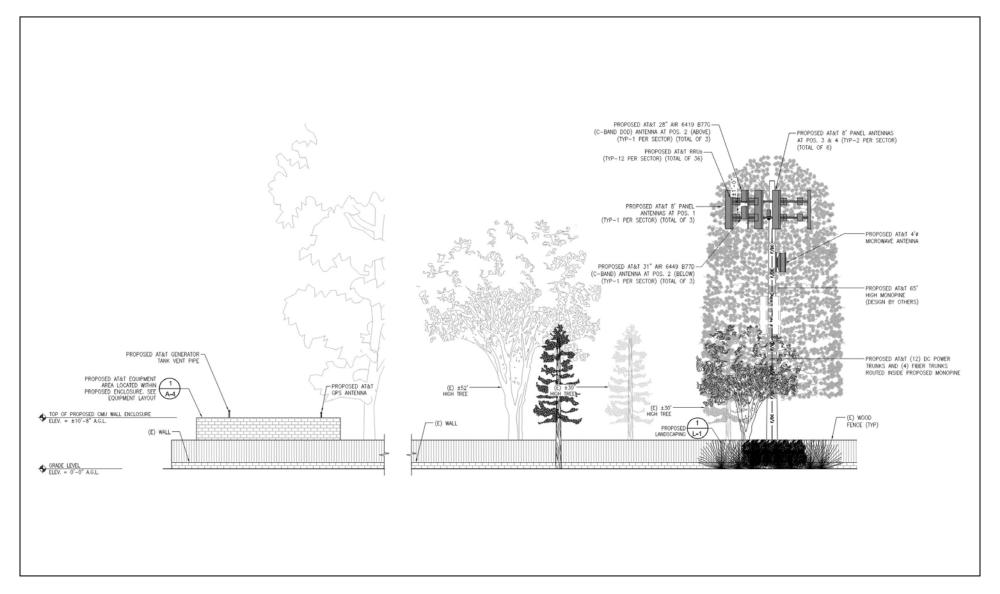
Exhibit D: ELEVATIONS (WEST - CONTINUED)
